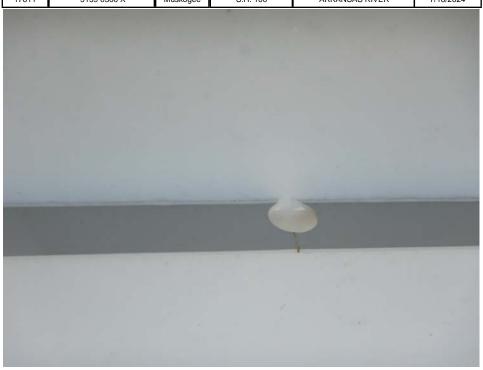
Looking southwest at span 6 girder 1, end of horizontal filed splice near floor beam 3. Note: 3/4-inch-long crack in the inboard face at the horizontal web splice termination has not propagated past the arrestor holes. 1/2-inch-long paint cracks along the top of the upper arrester
